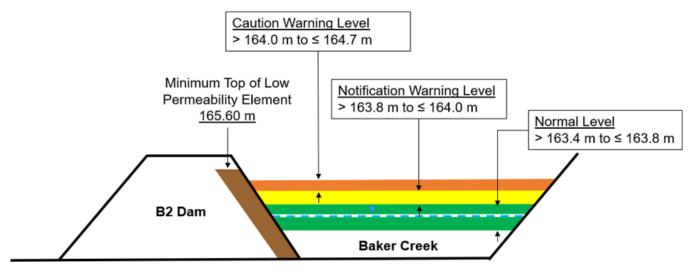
Water and Infrastructure Elevations for Baker Creek (not to scale)
